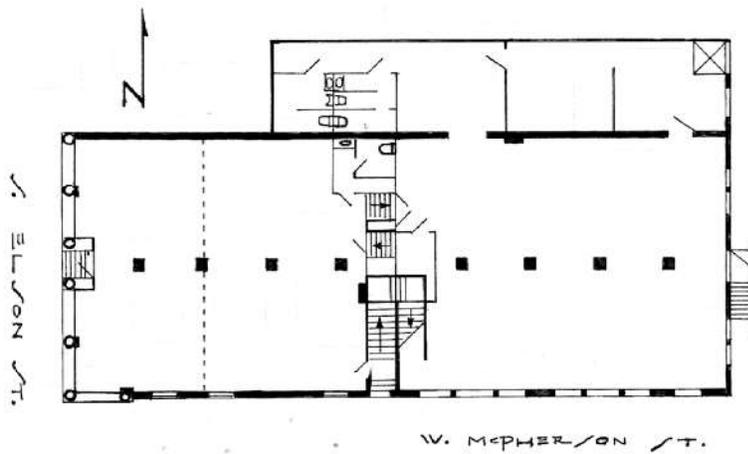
Image C: First Floor Plan for the Journal Printing Company Building (2010). Not to scale.
